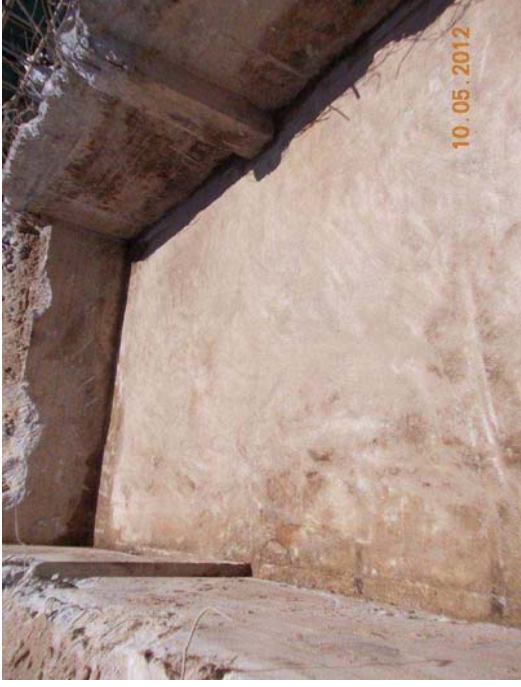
The Base and Walls of the Concrete Box Containment After Removal of the Three Kerosene Tanks.
